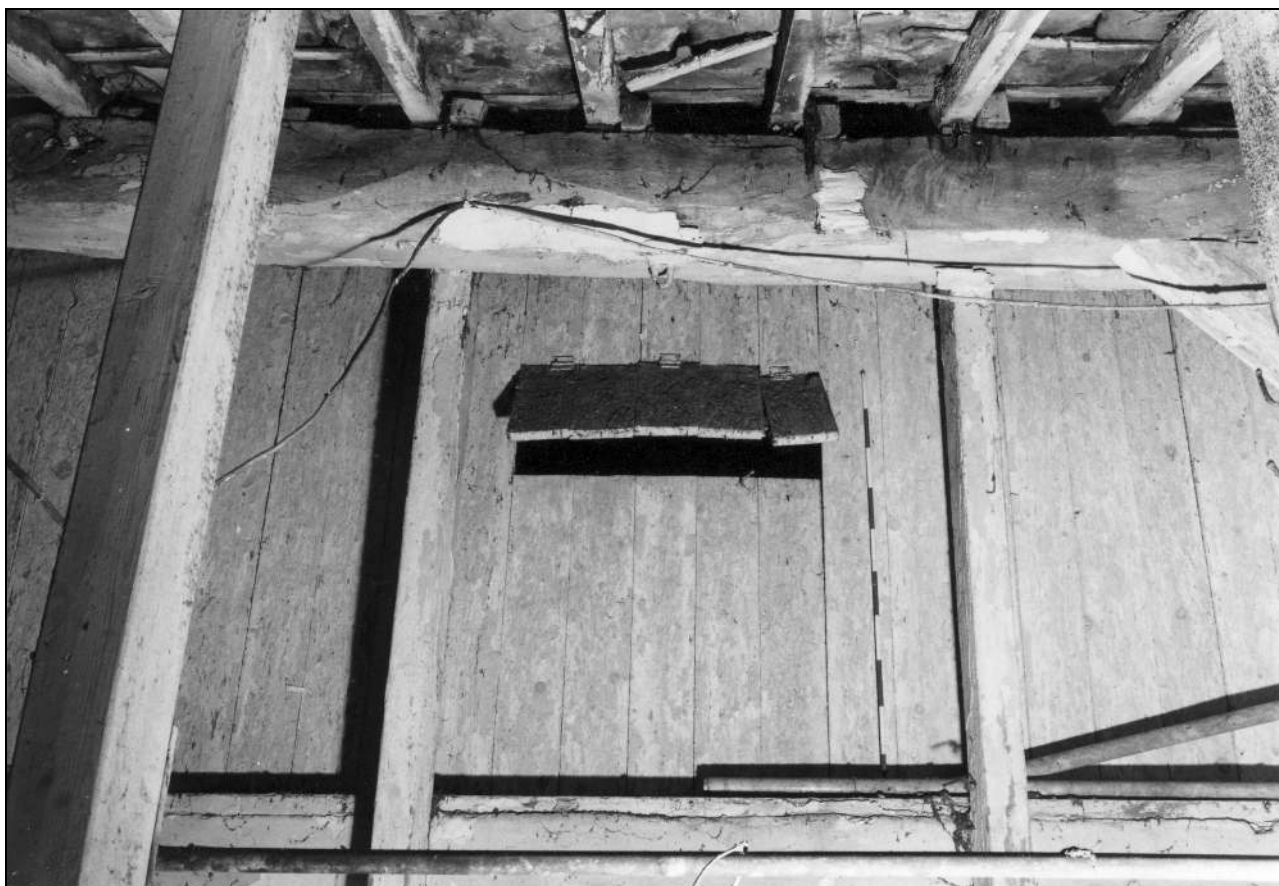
Plank partition to north side of south-west outshut (film 3, frame 7)
